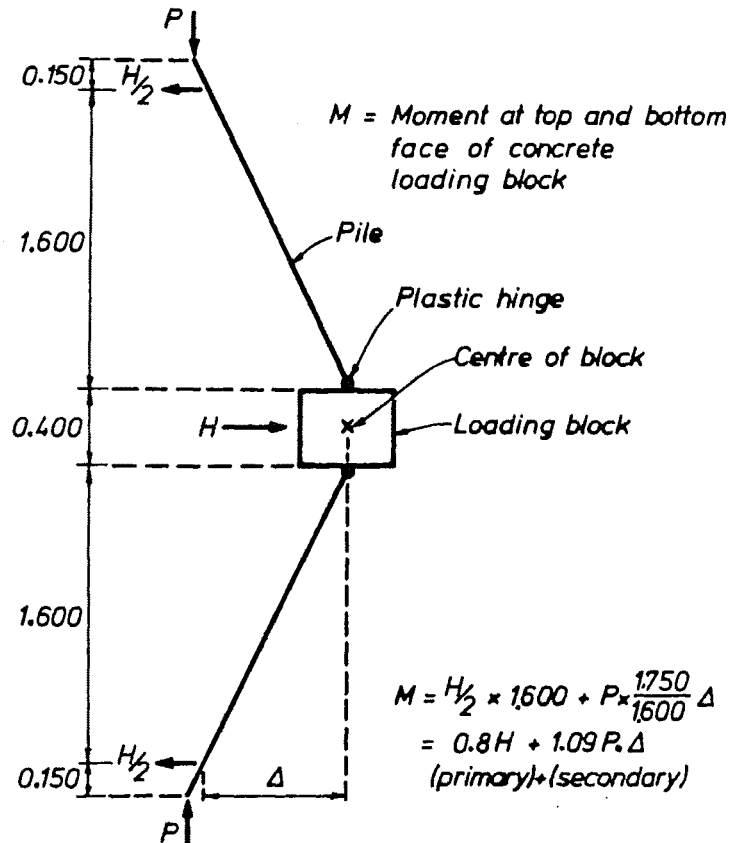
MOMENT AT FACES OF CONCRETE LOADING BLOCK
